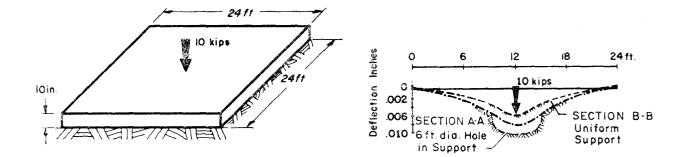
Pavement slab subjected to 10-kip wheel load at the center; with and without uniform subgrade support.
